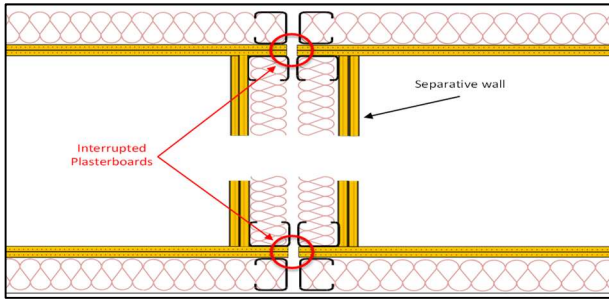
Horizontal section of the facade and internal wall junction, all plasterboards were considered interrupted by the inter-tenancy wall.
